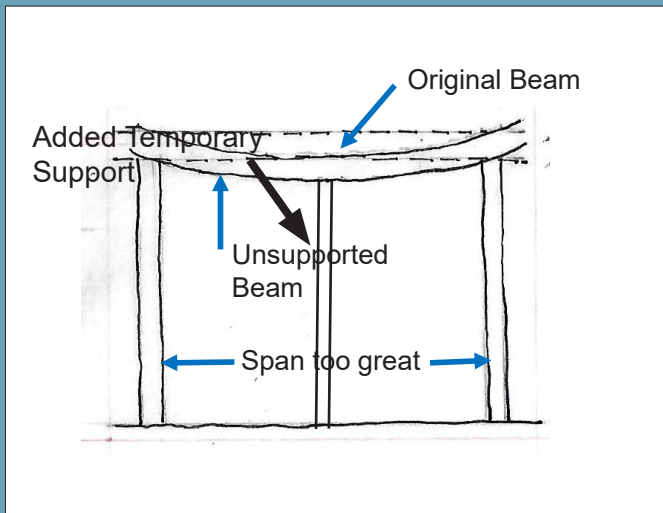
The diagram illustrates a sagging beam and indicates where to add a post to give temporary support.
